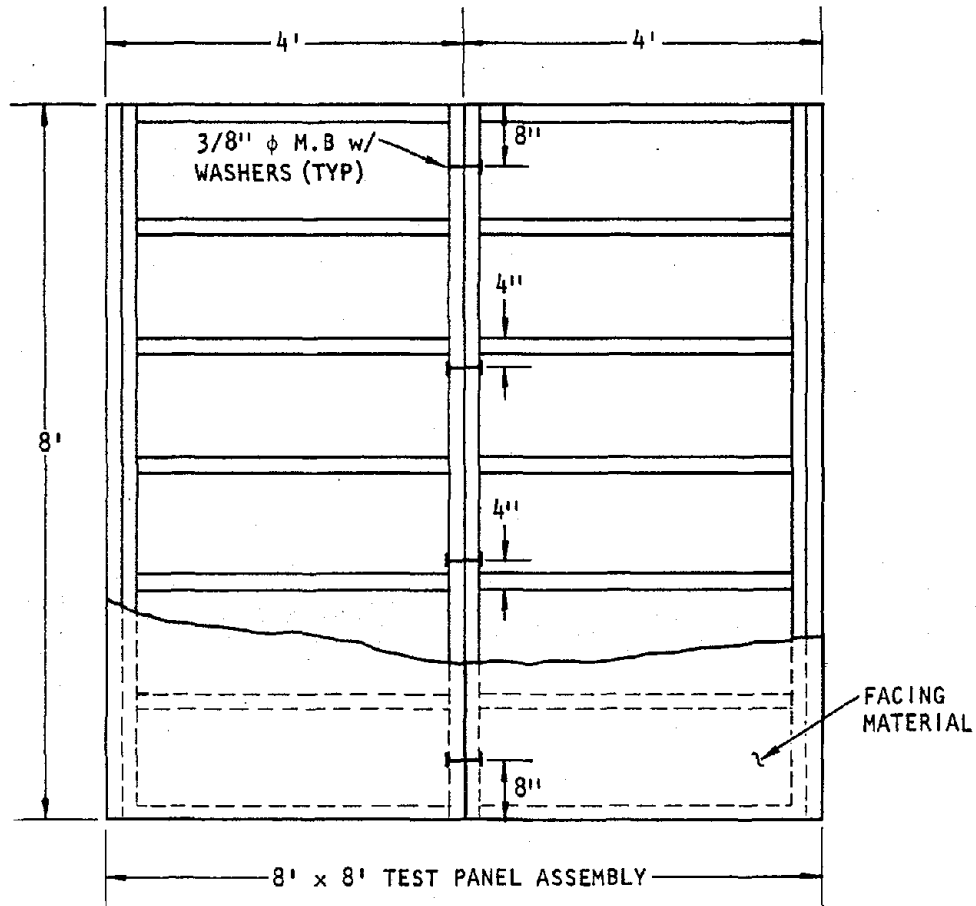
TYPICAL TEST PANEL FRAMING
